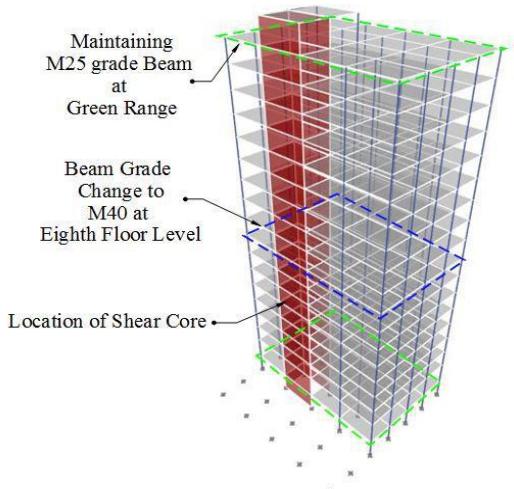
Beam Stability Case - Beams of different sizes (All M40 grade beams at eight floor level): Case BS4
